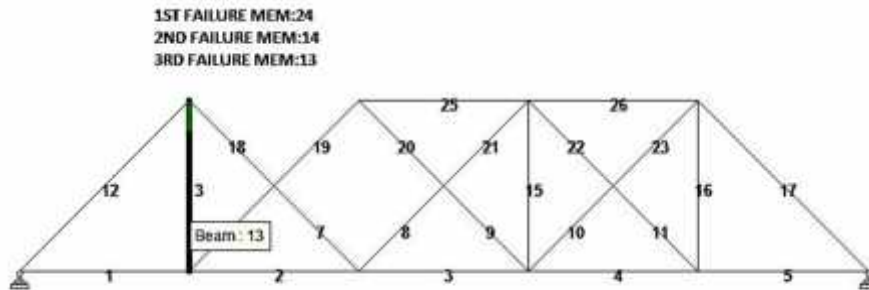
Geometrical configuration of the truss after failure of first two elements having minimum RI i.e element no 24 and 14.
